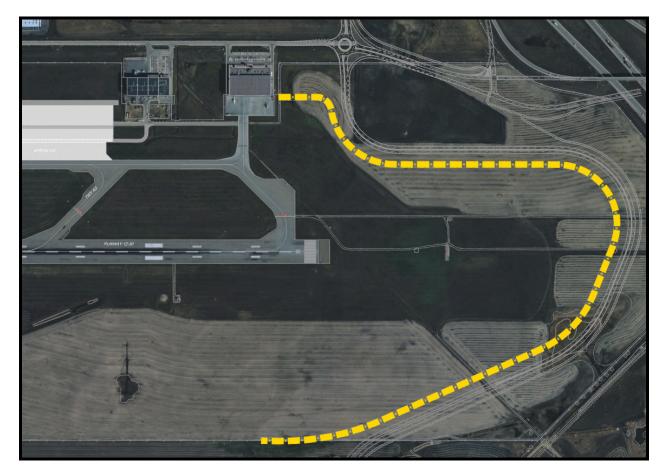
65th Avenue Fence and Airside Perimeter Road Relocation
